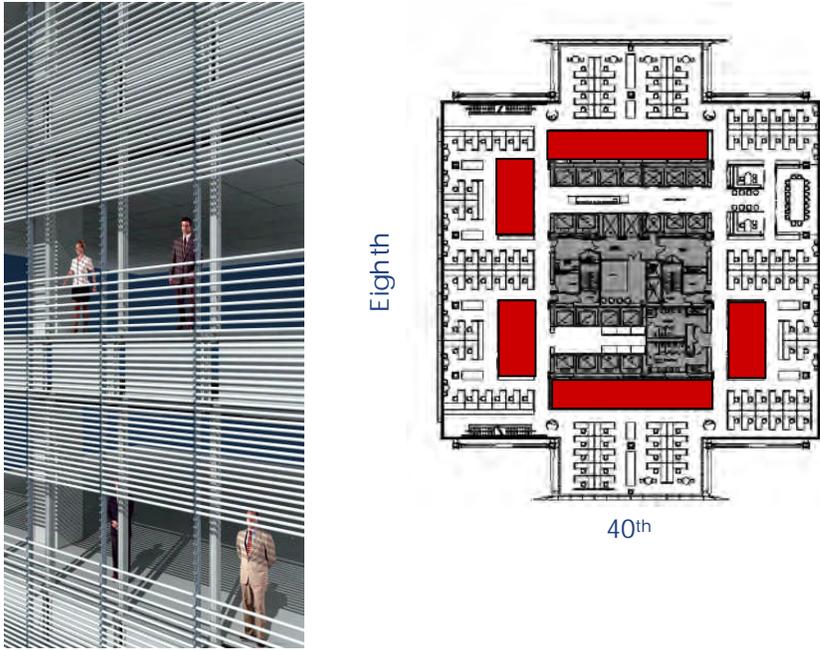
Rendering of the curtainwall design (left) and typical floor plan of the 51-storey tower with full-height offices near the core in red (right). © The New York Times.
